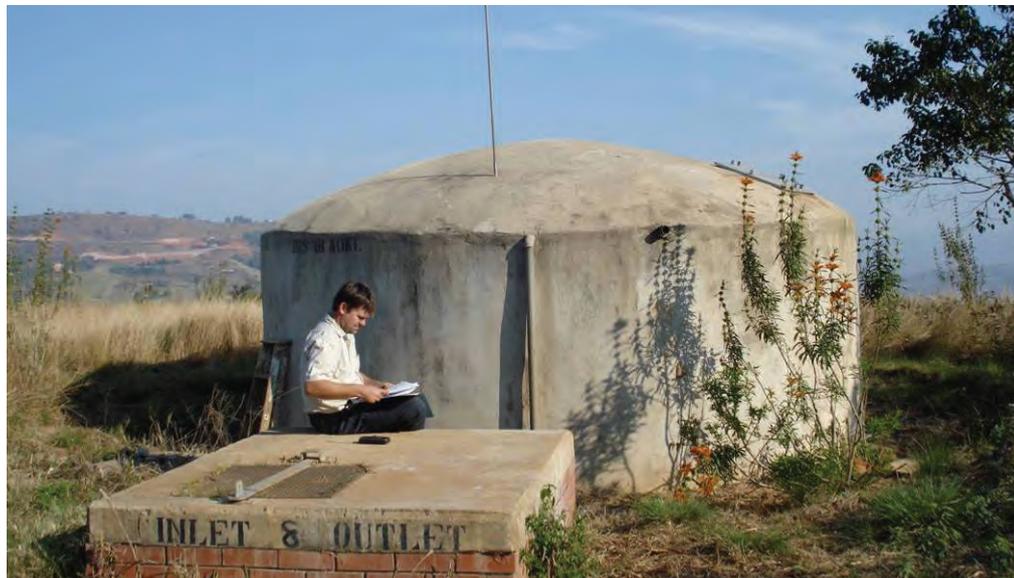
A 125 kℓ ferrocement reservoir constructed on the Esigedleni CWSS in 2003/2004 (inspected 2008). Rust streaks on walls are the result of the overflow pipe level being set too high – this level should be set below the roof joint.
